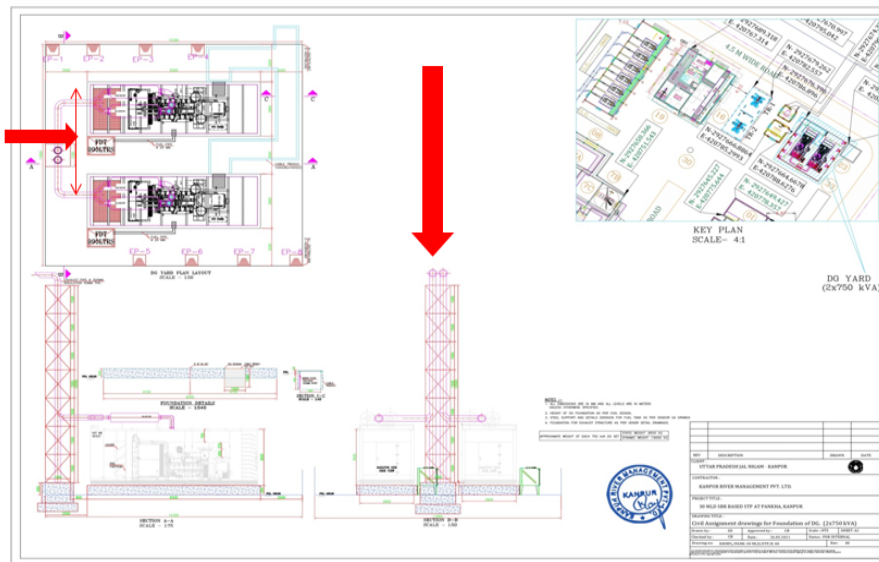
Approved drawing for exhaust chimney & Foundation work for DG set
